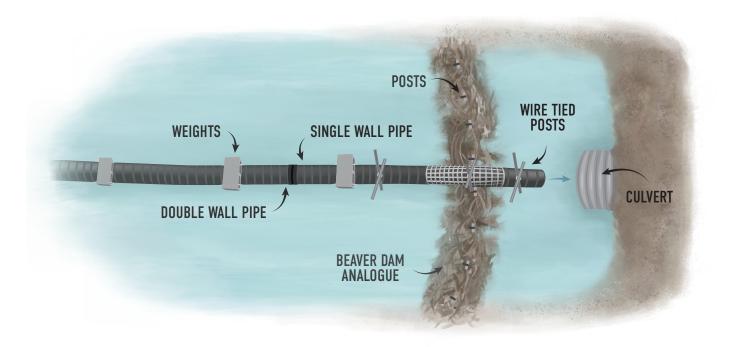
Combination of an anchor dam and pond leveler to create a pipe and dam culvert protection system.
